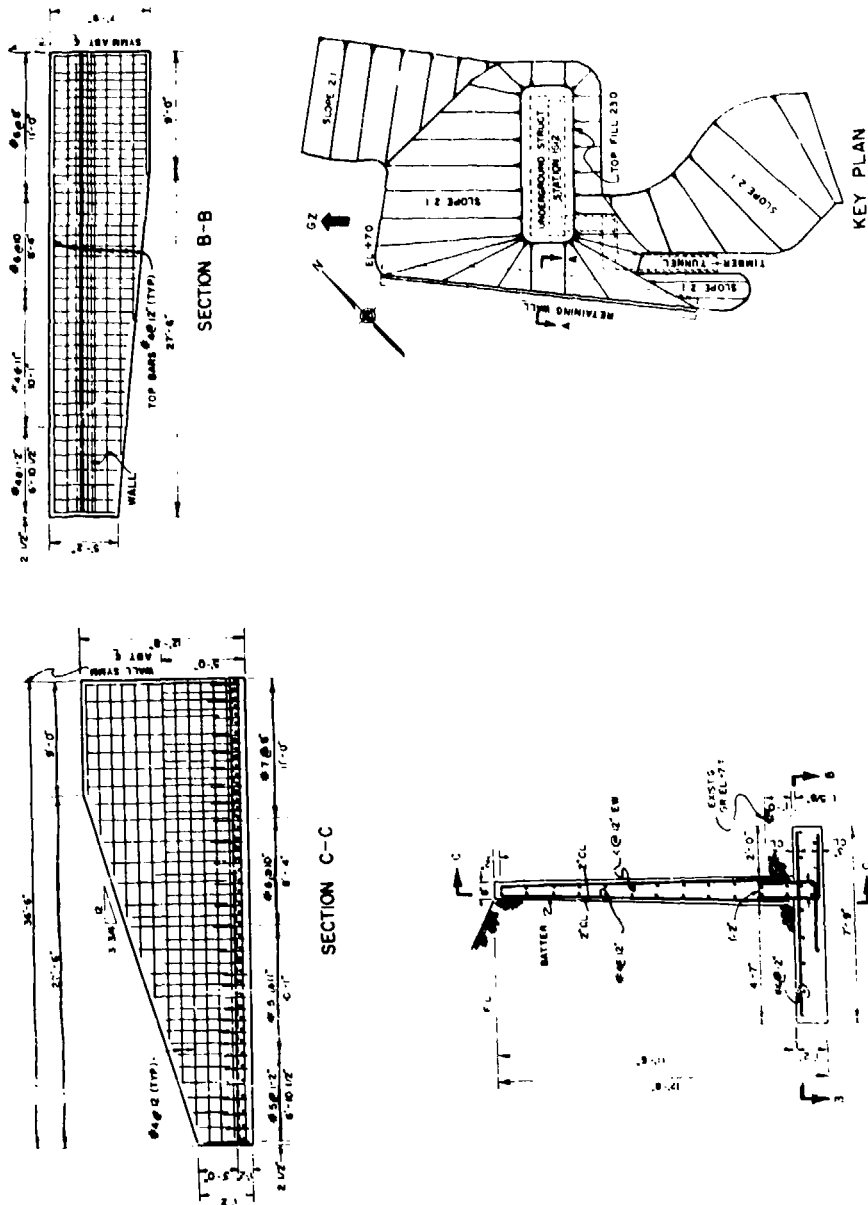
Plan and elevation for (Item 34) Station 1612, Site Yvonne.
